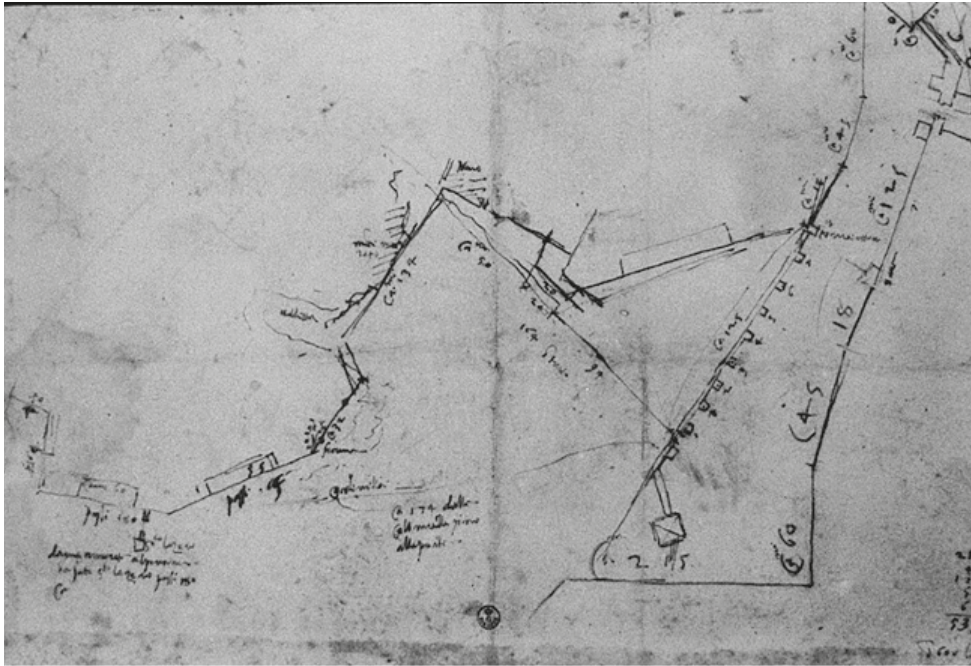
Gabinetto Disegni e Stampa degli Uffizi, drawing n. 1019A.
